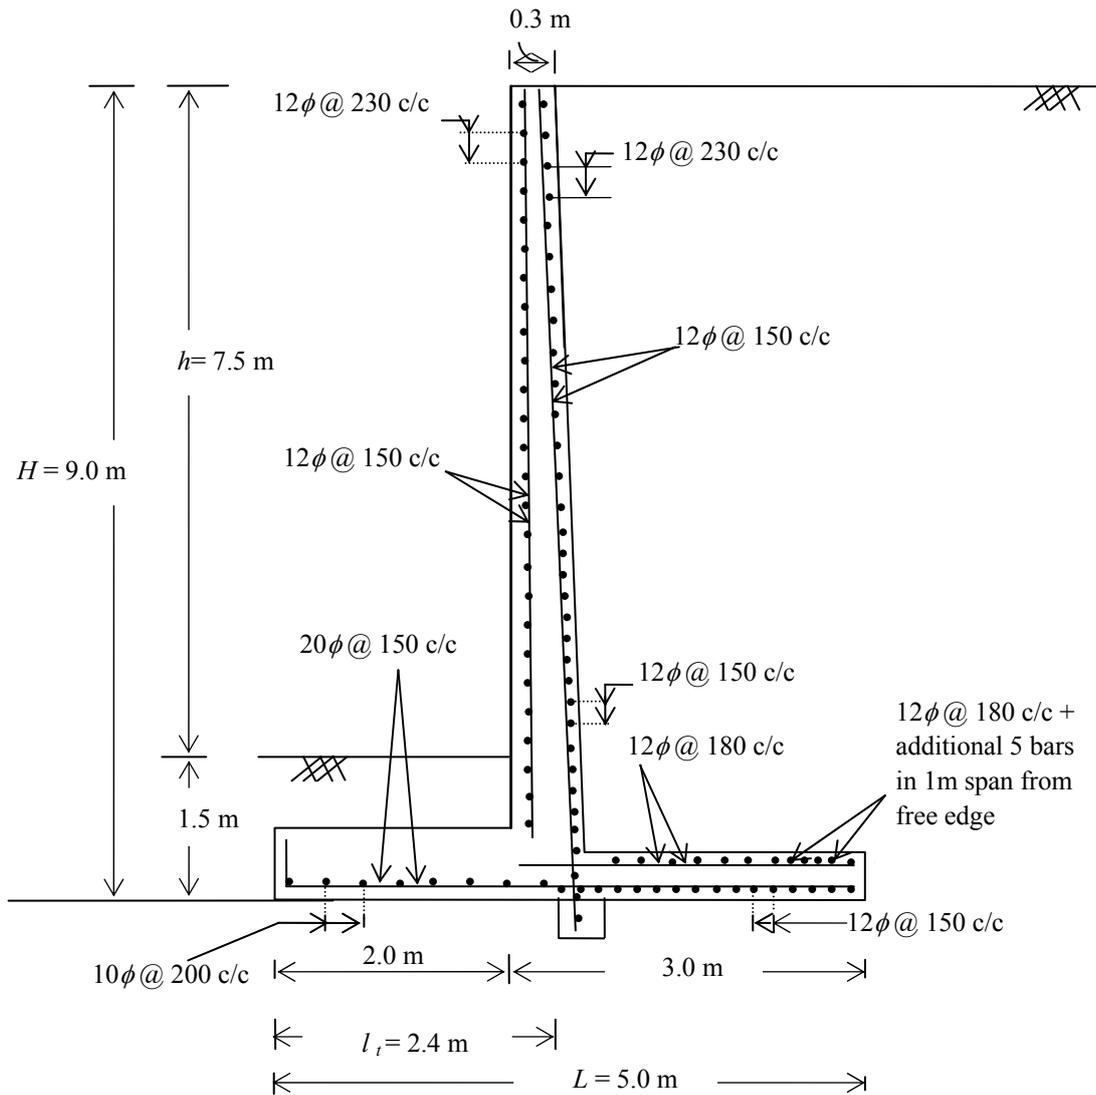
Reinforcement details on stem, toe slab and heel slab.
